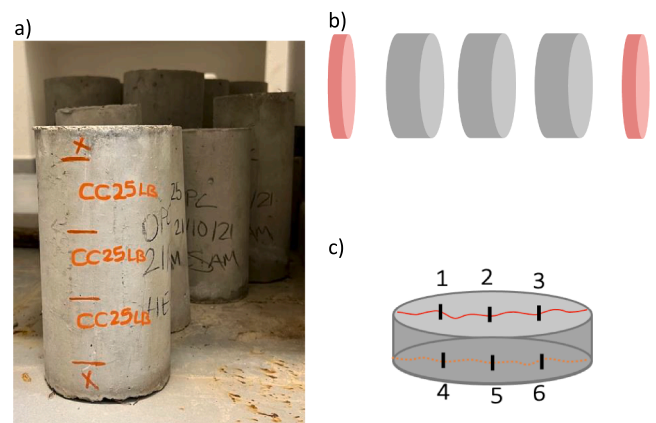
A) cylinder marks before cutting the disks, b) cut of cylinders to obtain disks, c) crack measurement points after pre-cracking.
